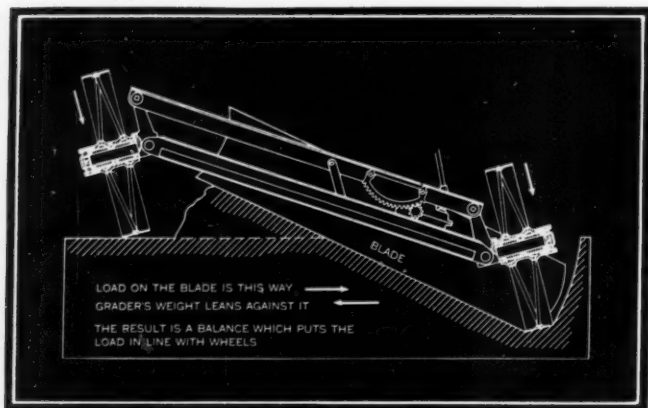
Design of leaning wheel arrangement in a road grading machine
